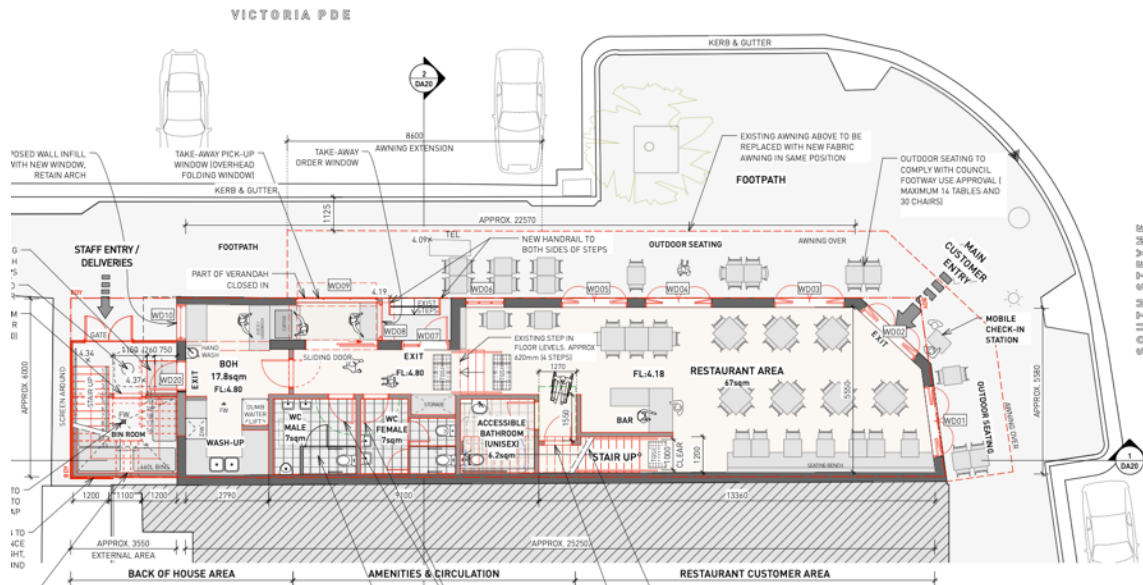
, Proposed ground floor plan, U+I Building Studio, Mar 2021.
